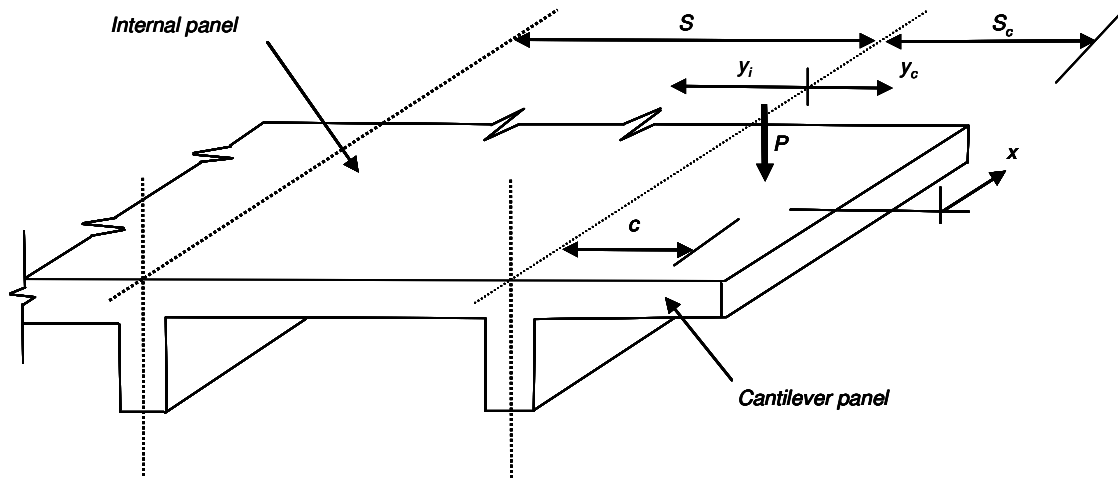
(a): Configuration of a bridge deck slab subjected to a concentrated load on the cantilever overhang (Reproduction; Mufti et. Al., 2006)
